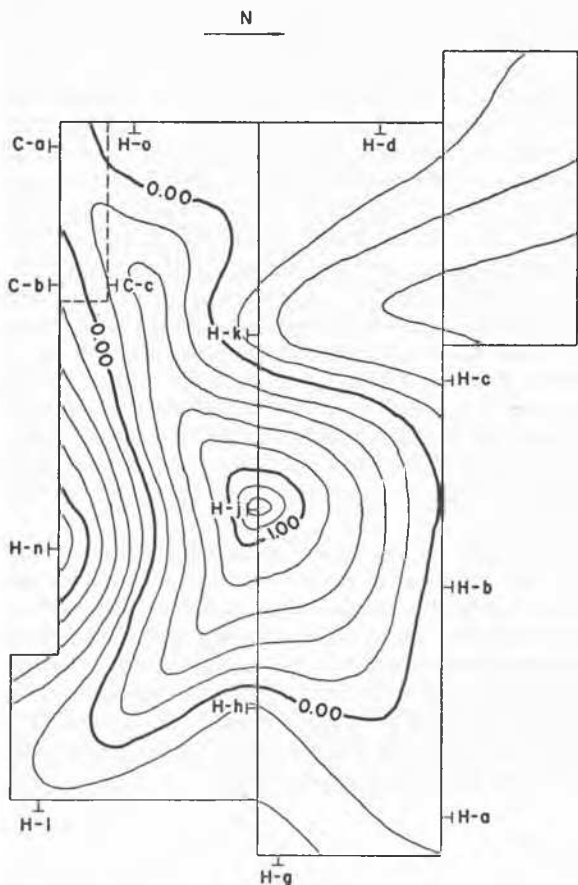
House No. 5. Elevation Contours October 22, 1948. Contour Interval: 0.20 in.
